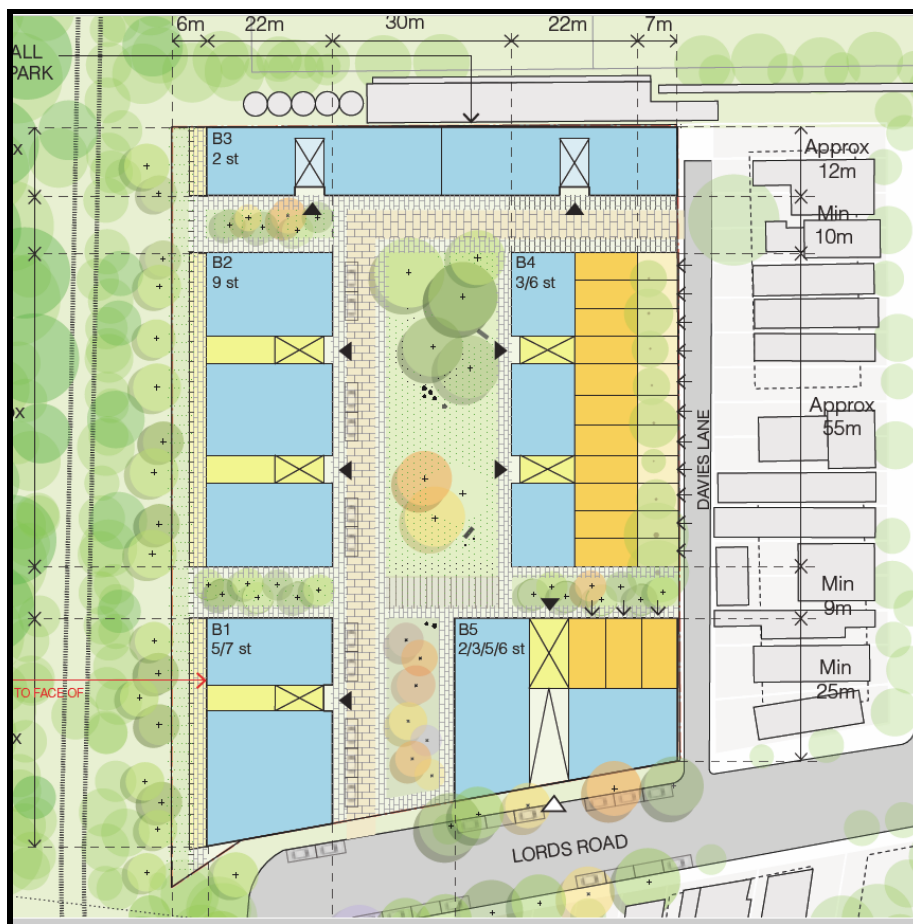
Proposed Master Plan for the site (Source: UDR, page 19)
